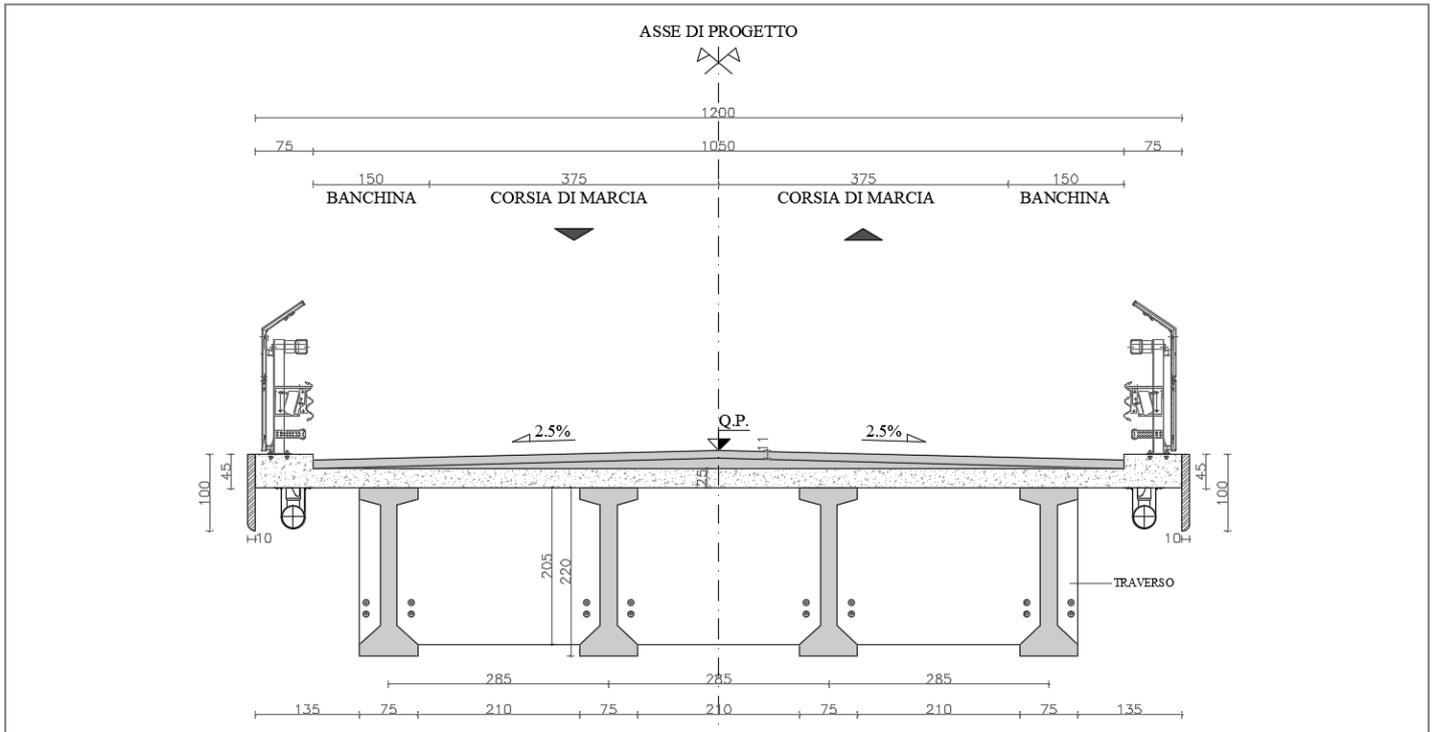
Bridge deck: cross section at mid span / Impalcato: sezione trasversale in campata.
